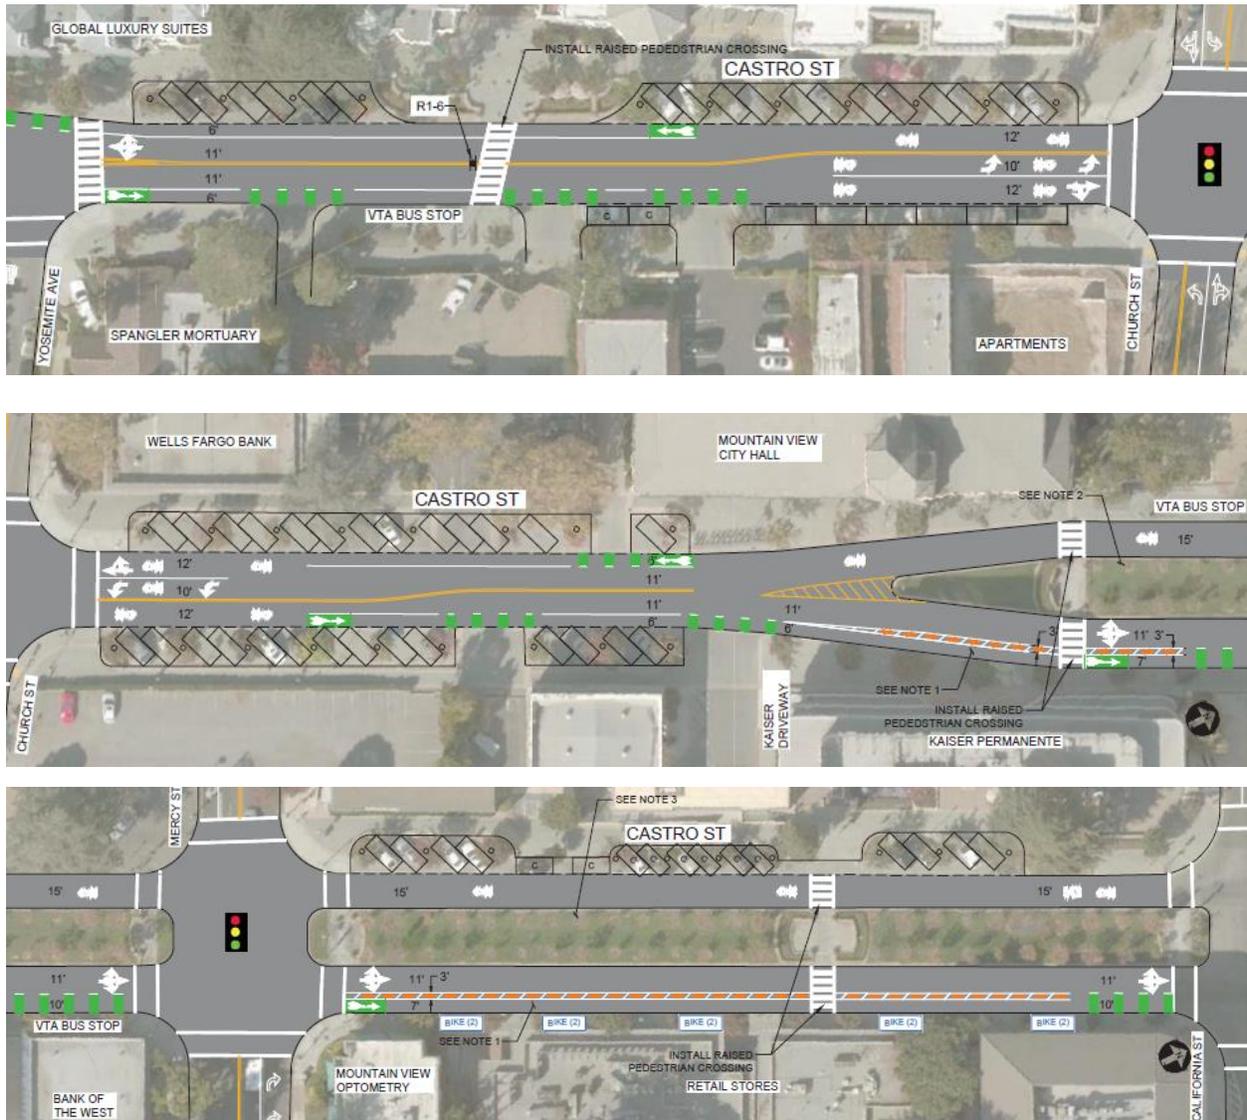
Short-/Medium Term Alternative 1—Yosemite Avenue to California Street, Some Bike Lanes and Angled Parking; No Changes to Church Street Intersection
